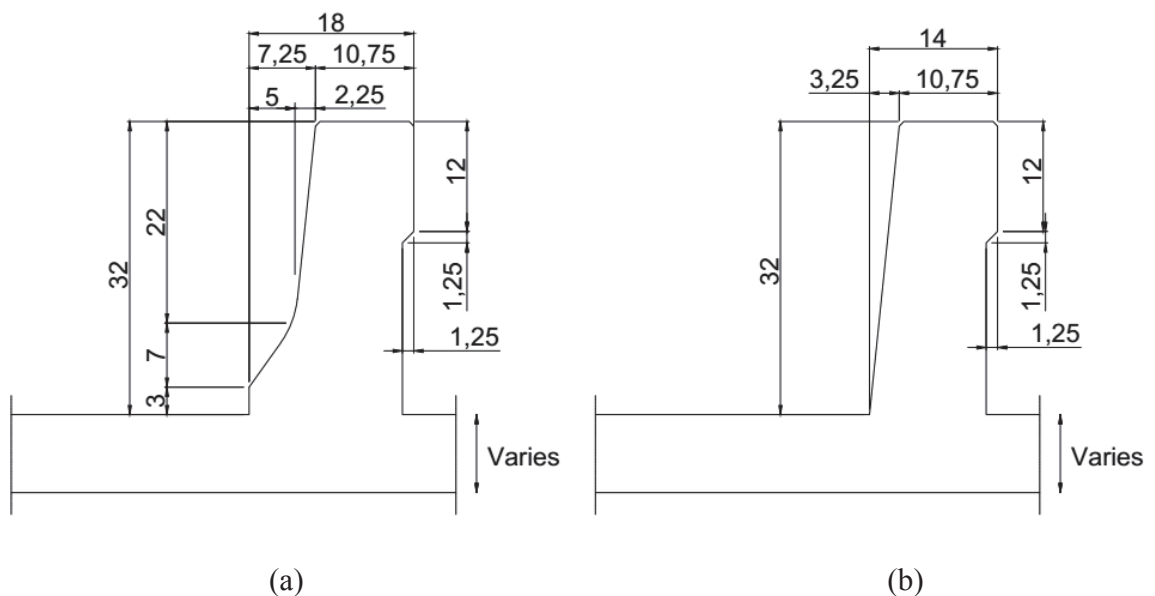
Geometry of typical section A-A (a) and typical section B-B (b)
